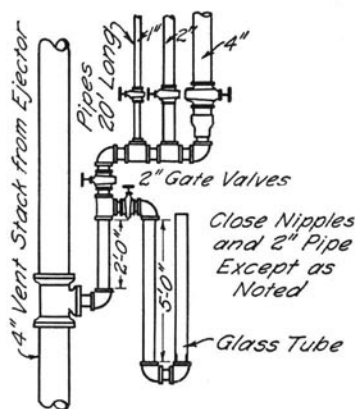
CONNECTIONS TO 4-IN. STACK IN RIDGLEY FARMERS STATE BANK BUILDING
